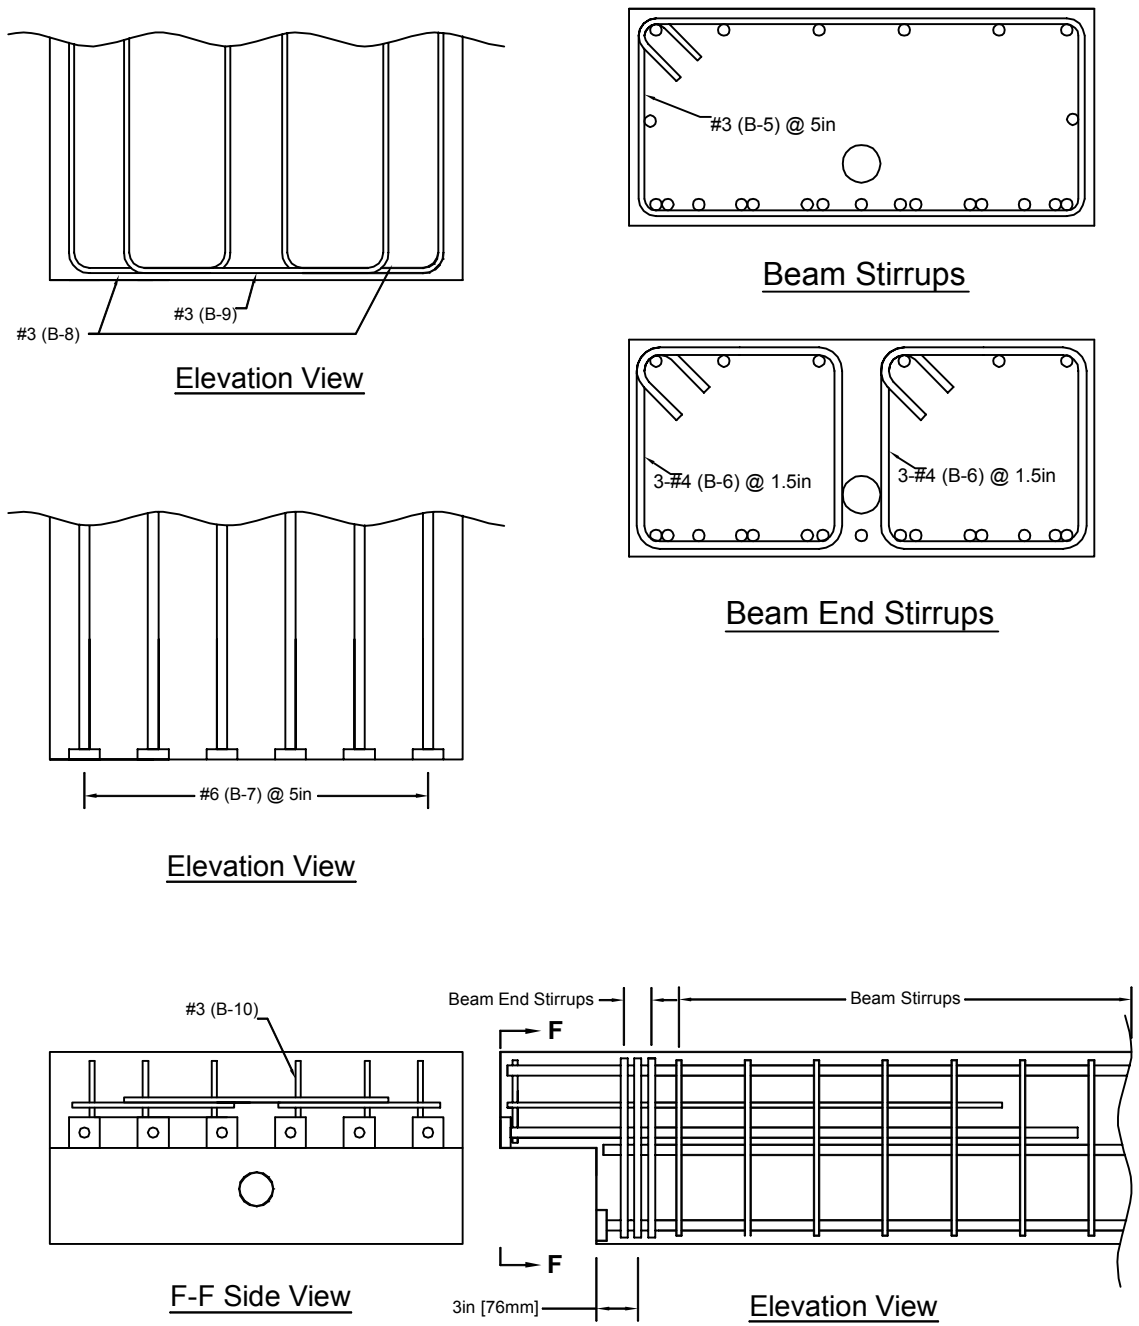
Bridge Plans Sheet 15; Beam End and Stirrups.
